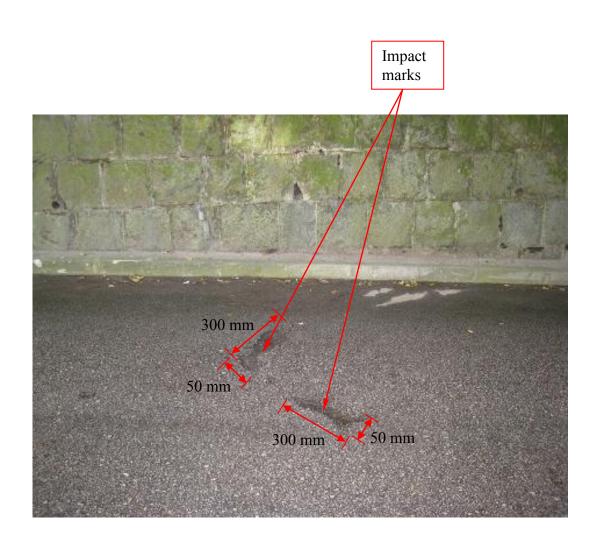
Impact Marks on Pavement of Po Shan Road (Photograph taken on 25 July 2007)
